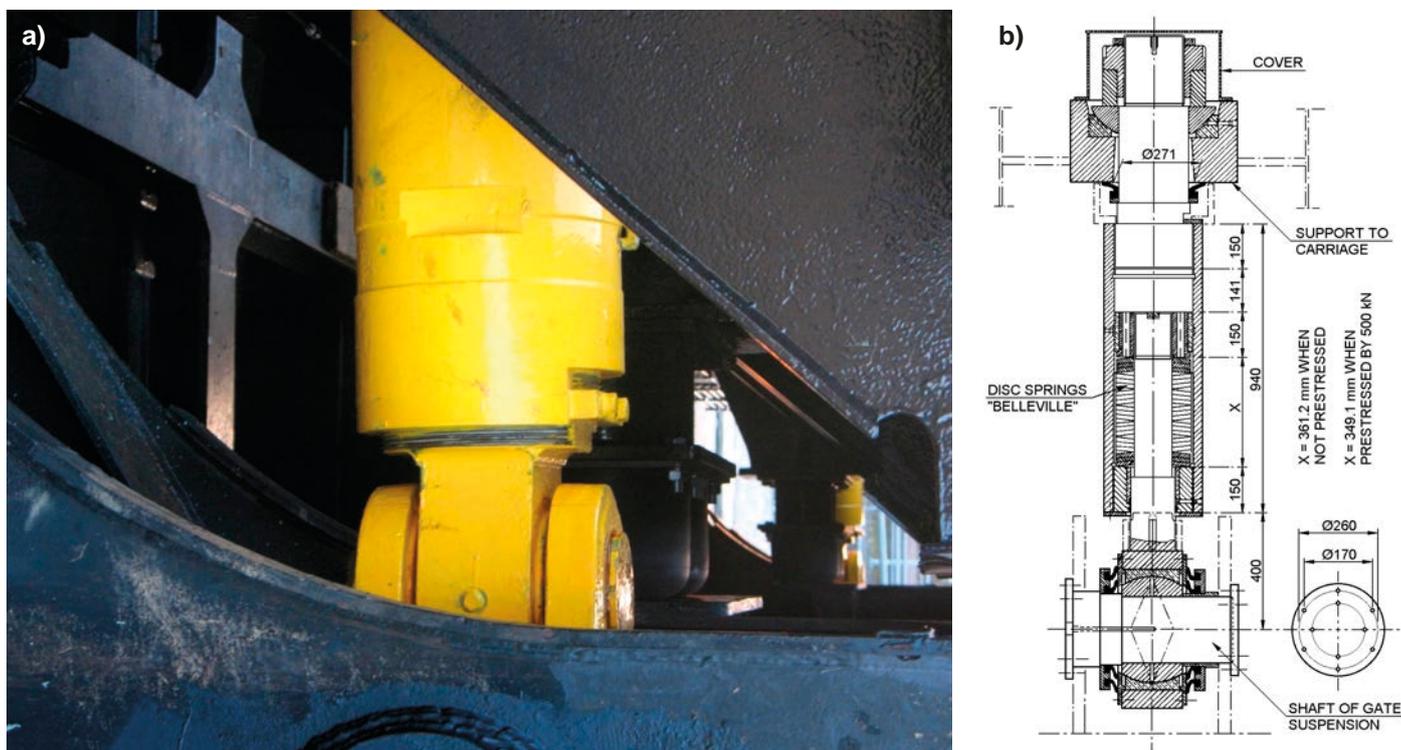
Suspension of the Zandvliet and Berendrecht Lock gates to upper carriage: a) spring-disc hangers on gate, photo R. Daniel, b) typical Belleville hanger [1, 11]
